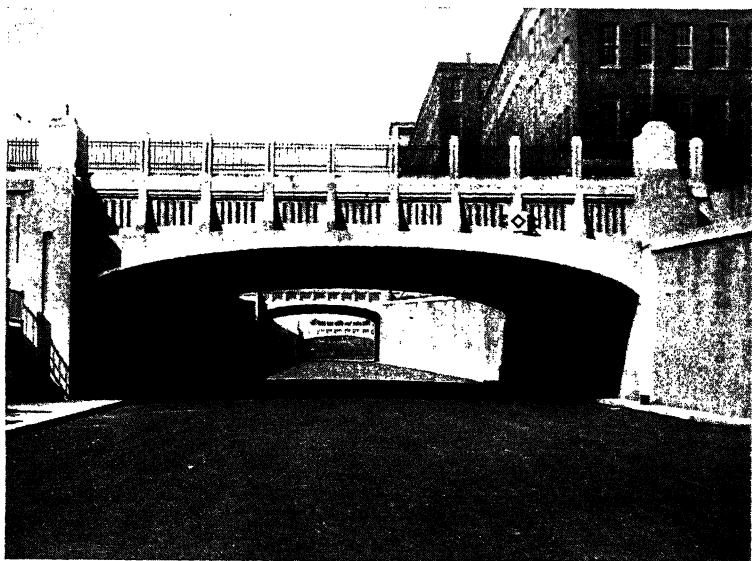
A.—Rigid-frame bridge over Raymond Boulevard, Newark, N. J.
